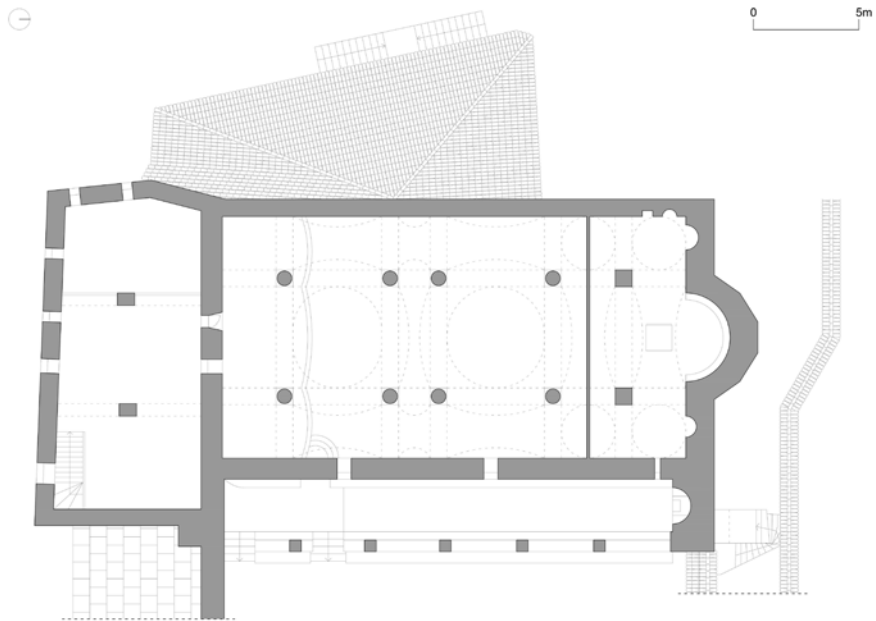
Albania, Berat, Onufri Museum, first floor plan
